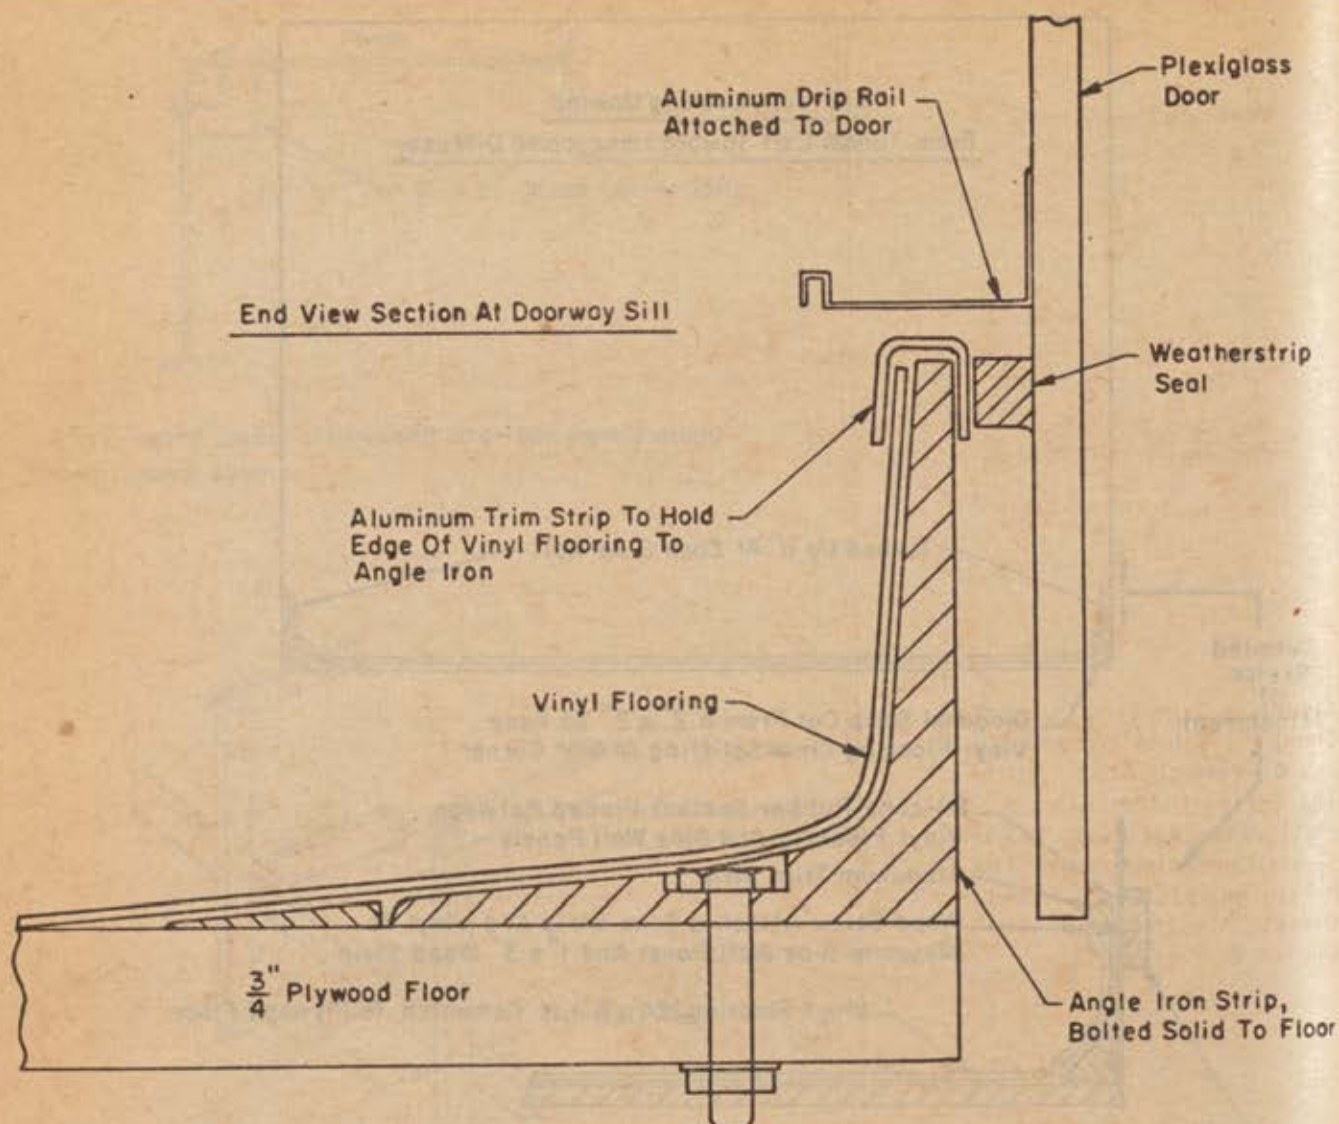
Vinyl Flooring (for Water Collection and Drainage)
